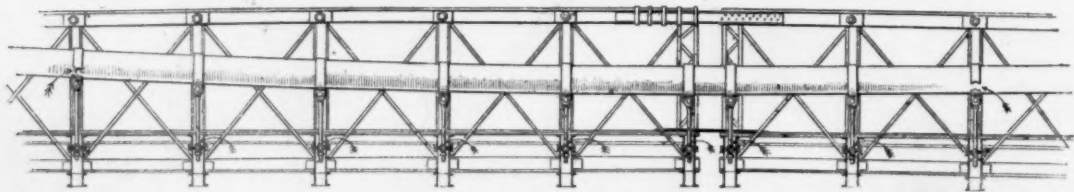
Side Elevation at Center of Bridge, Showing Location of Breaks.
